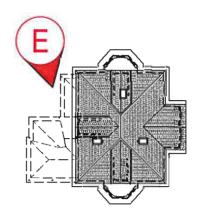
PHOTO E: ADDITION SIDE & REAR / NORTH WEST DETAIL
